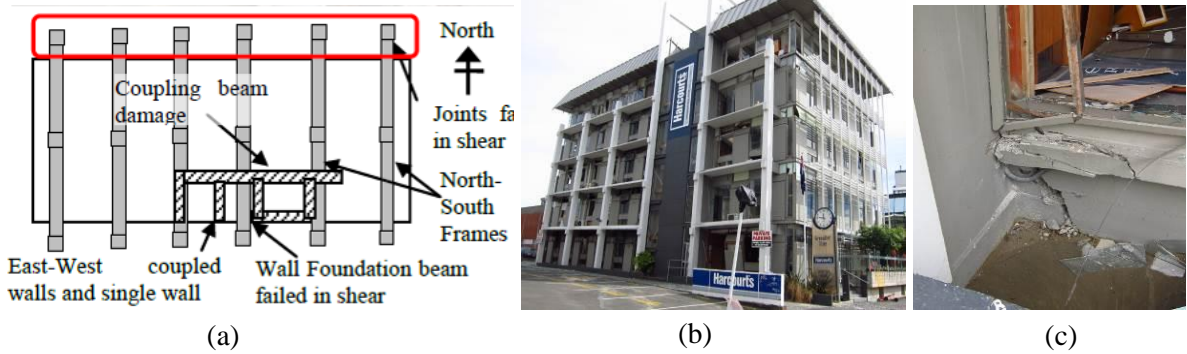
5-storey building with shallow foundation failure beneath core walls: a) plan; b) south-east elevation; c) shear failure of ground beam connected to shear wall (Adopted from Kam *et al*, 2012)
